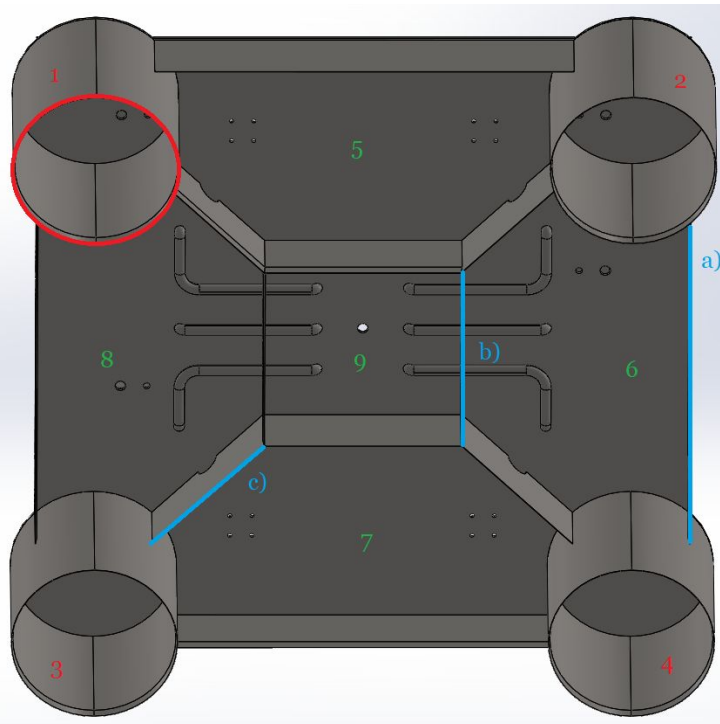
Overview of separate suction caisson sections (Ocean Grazer, 2020)
